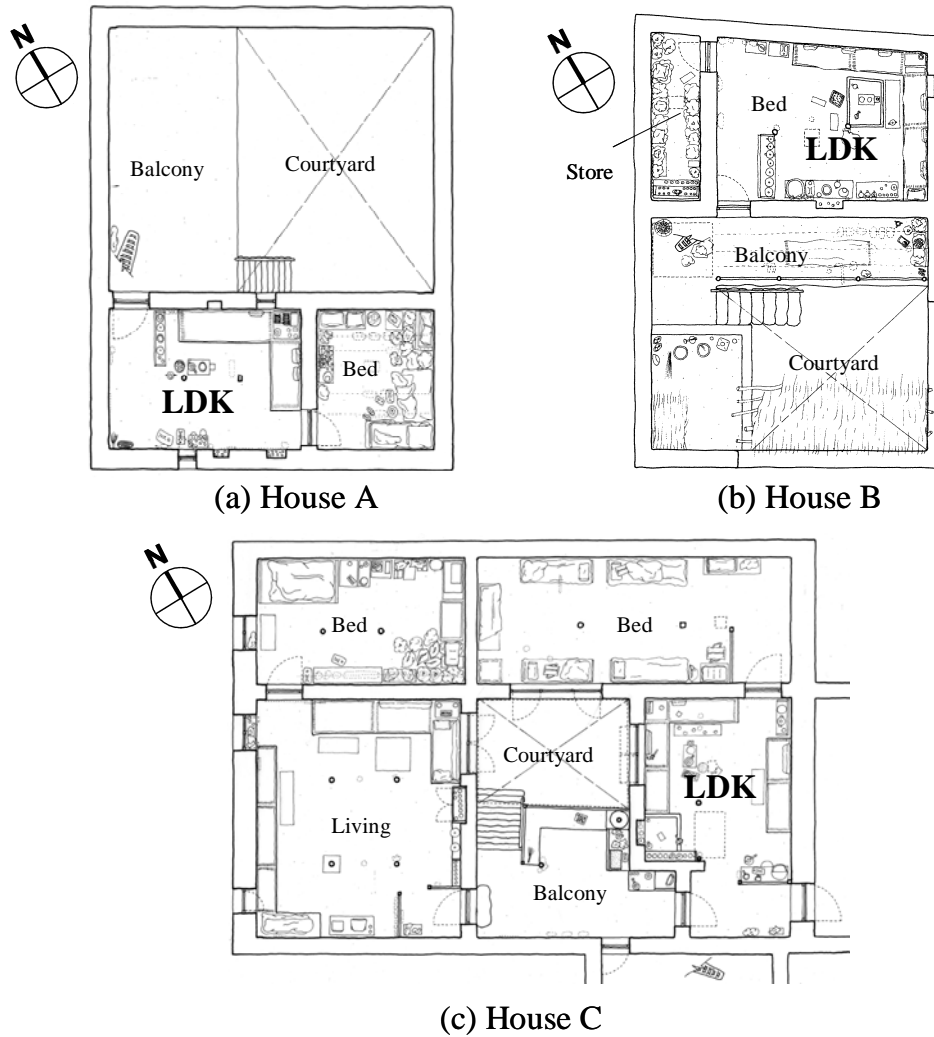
Plan of the investigated house (2F, Scale: 1:200)
